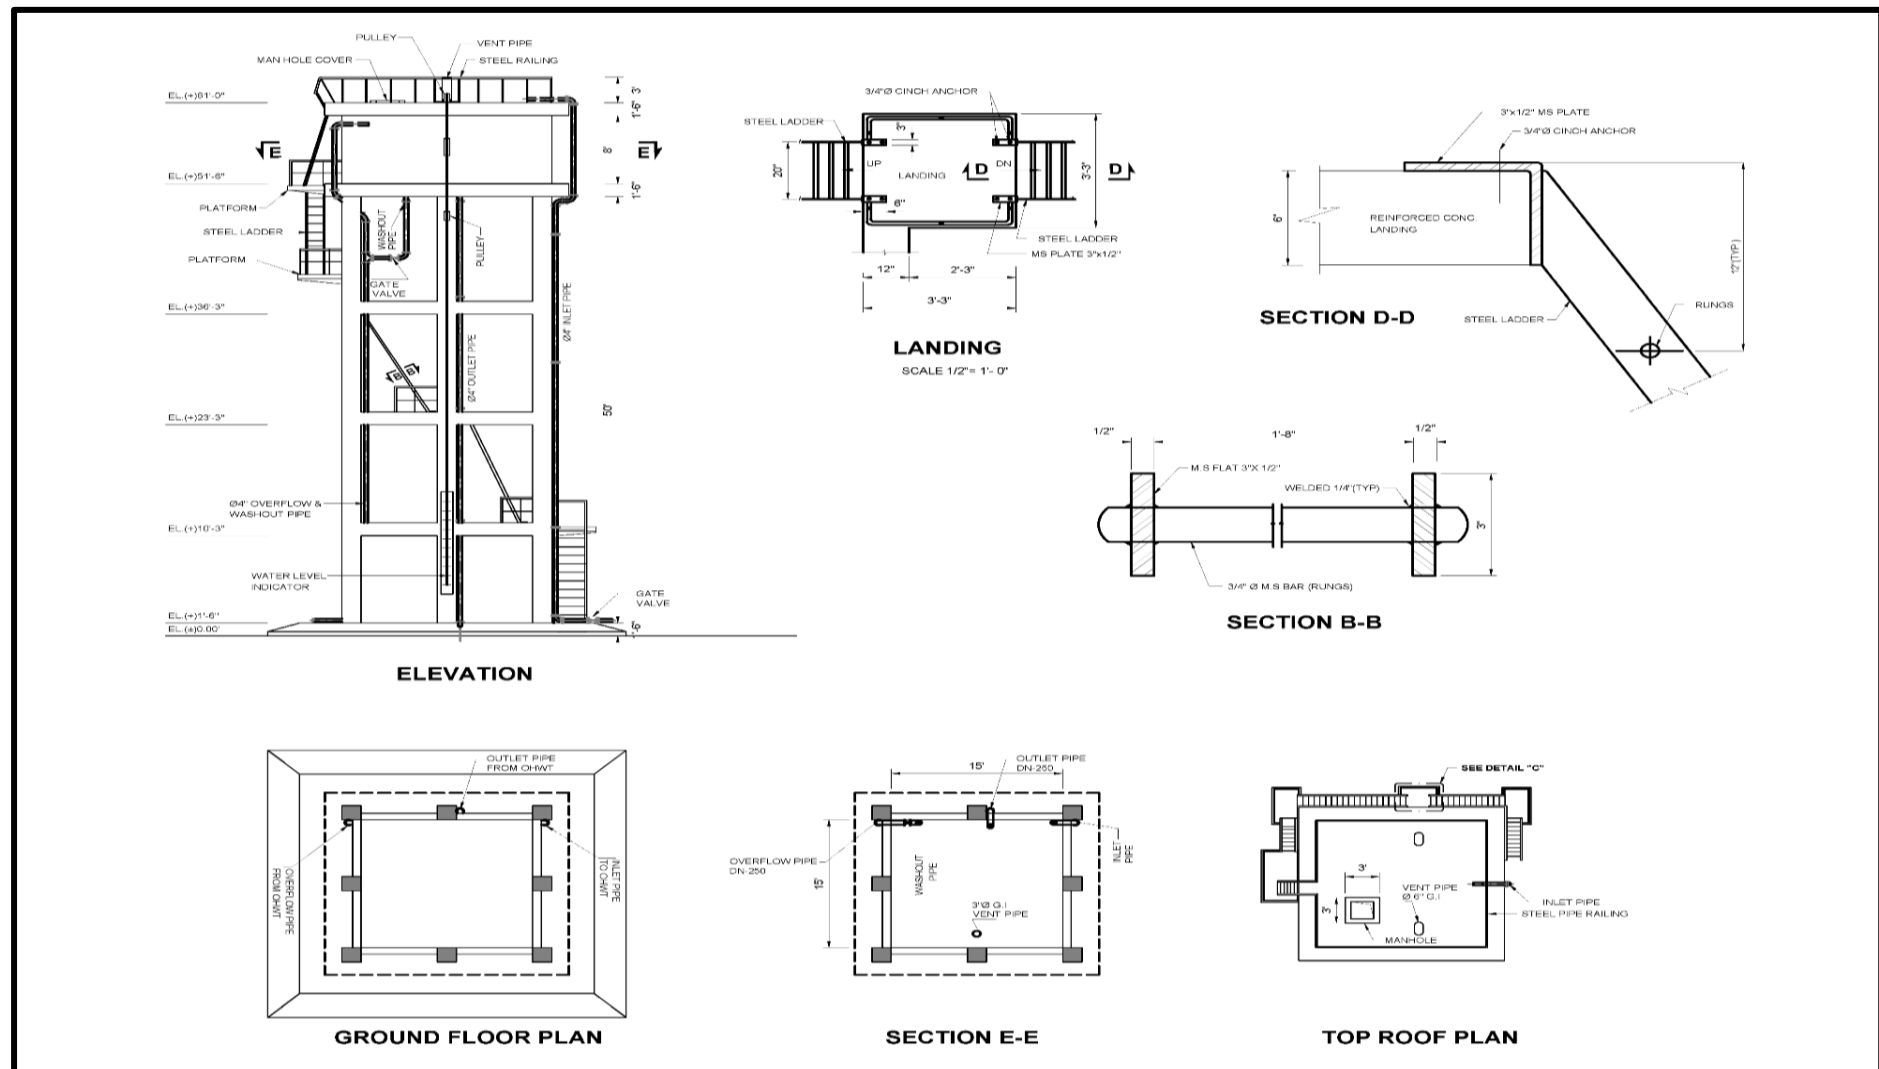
Typical Elevation and Section of Overhead Water Tank
